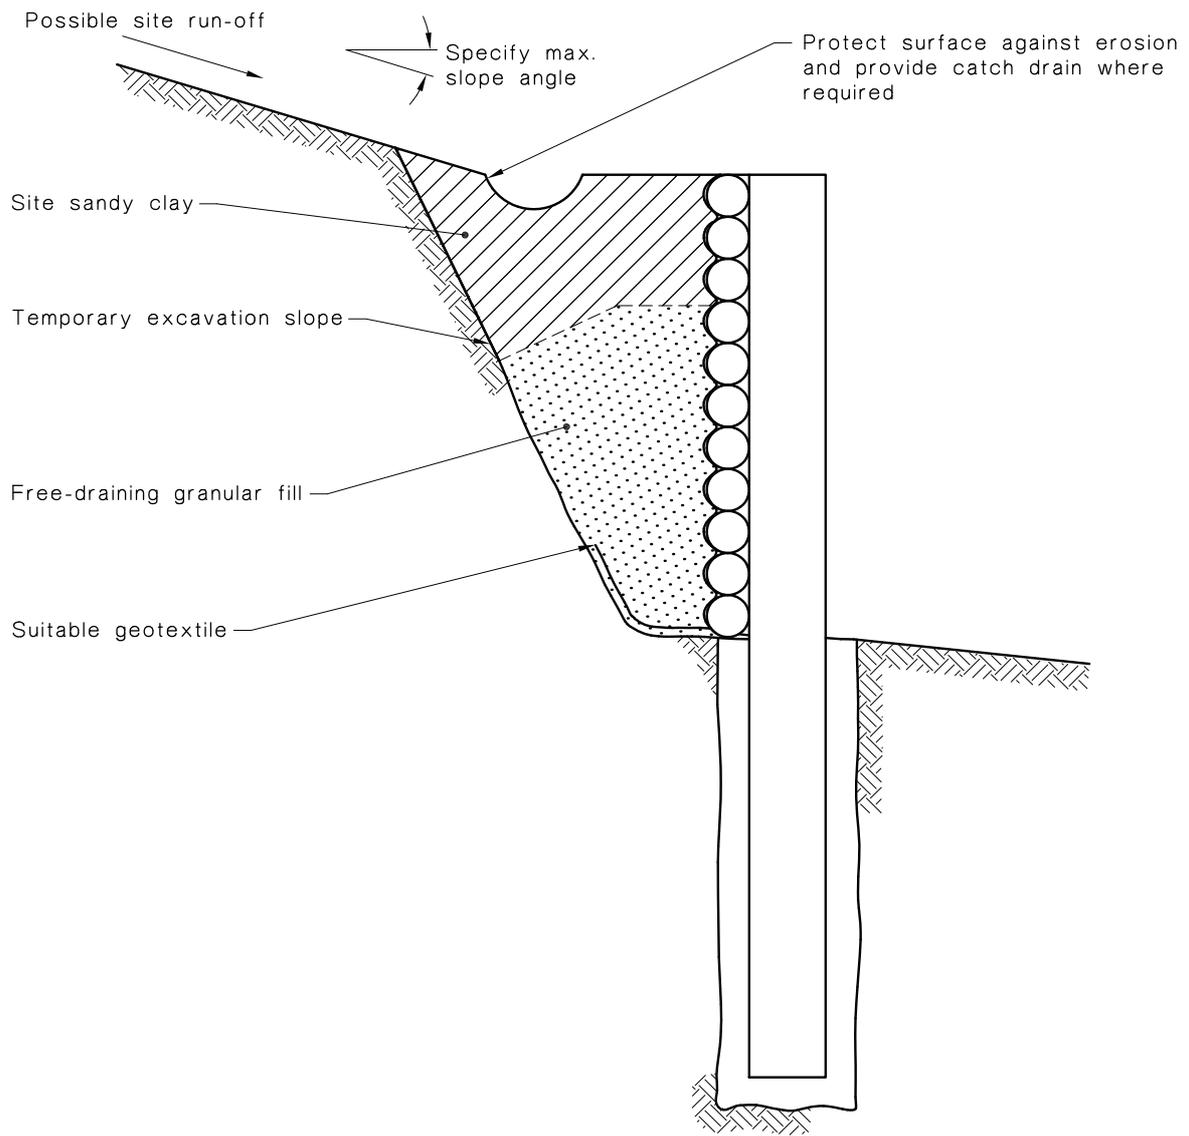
TYPICAL SECTION—POST-AND-LOG WALL DRAINAGE
